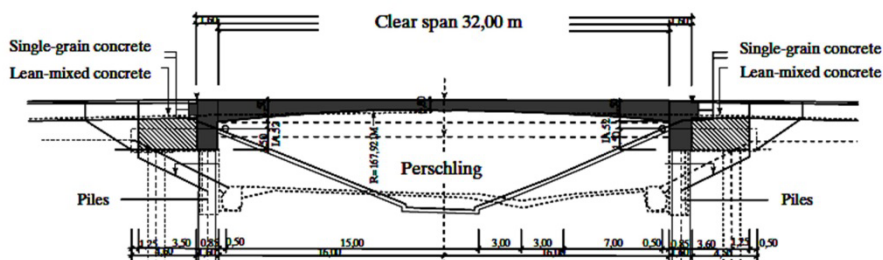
Elevation layout of fully integral abutment bridge 'Perschling Bridge' (Geier, 2011)
